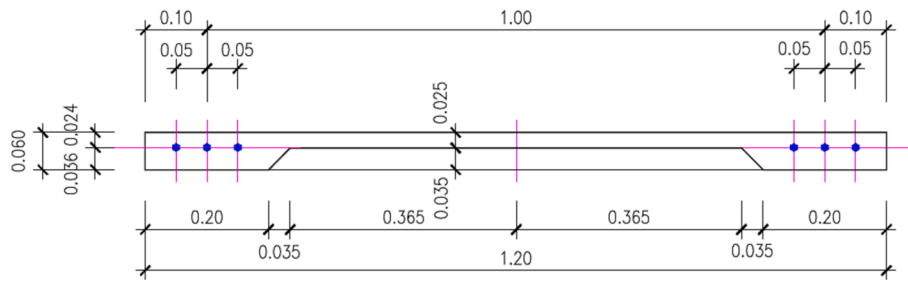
Typical cross section of the footbridge. Dimensions in m.
